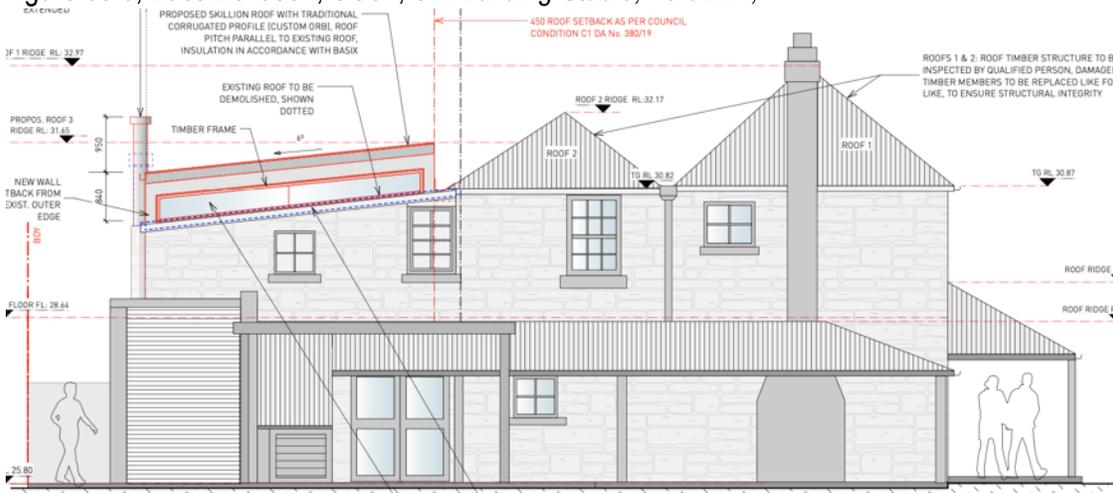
, West Elevation, CC33, U+I Building Studio, 10/02/21
